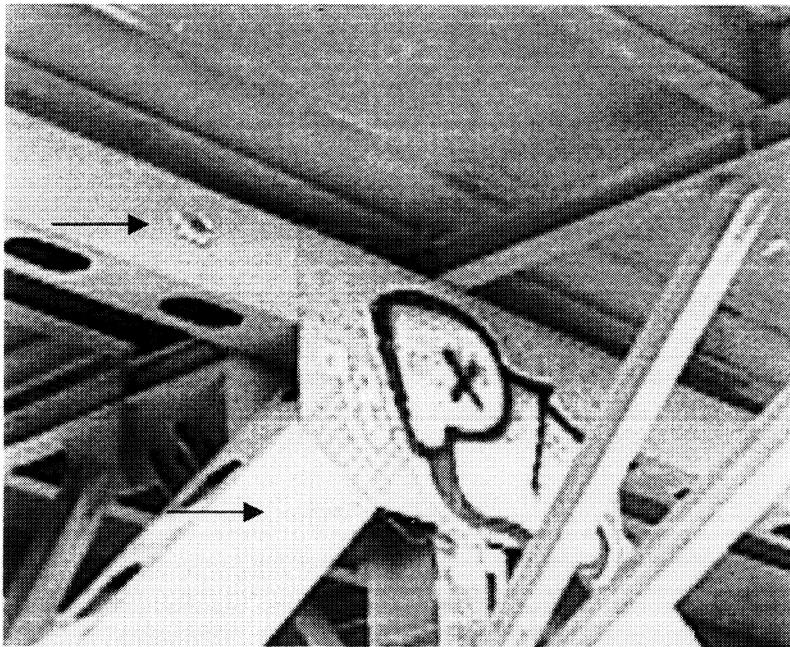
Gaged Upper Chord and Diagonal on Exterior of East Truss
